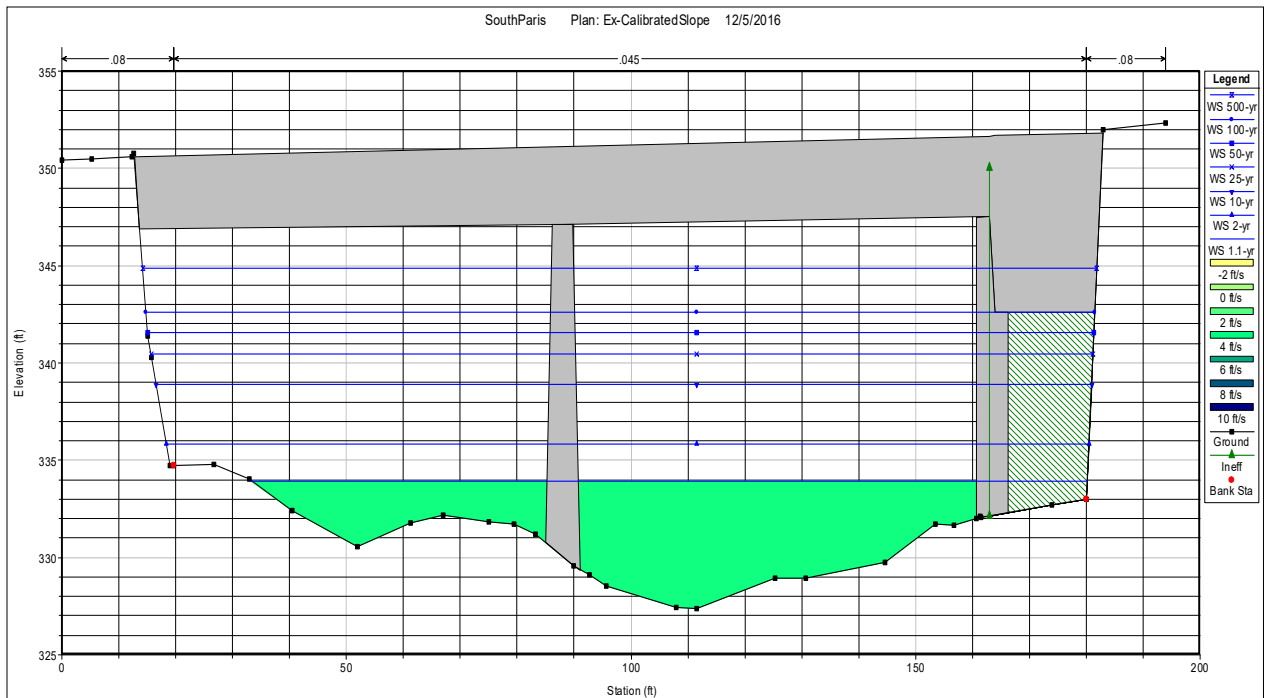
Existing bridge, upstream face section. Section is plotted facing downstream. The left channel shows impact of rubble.
